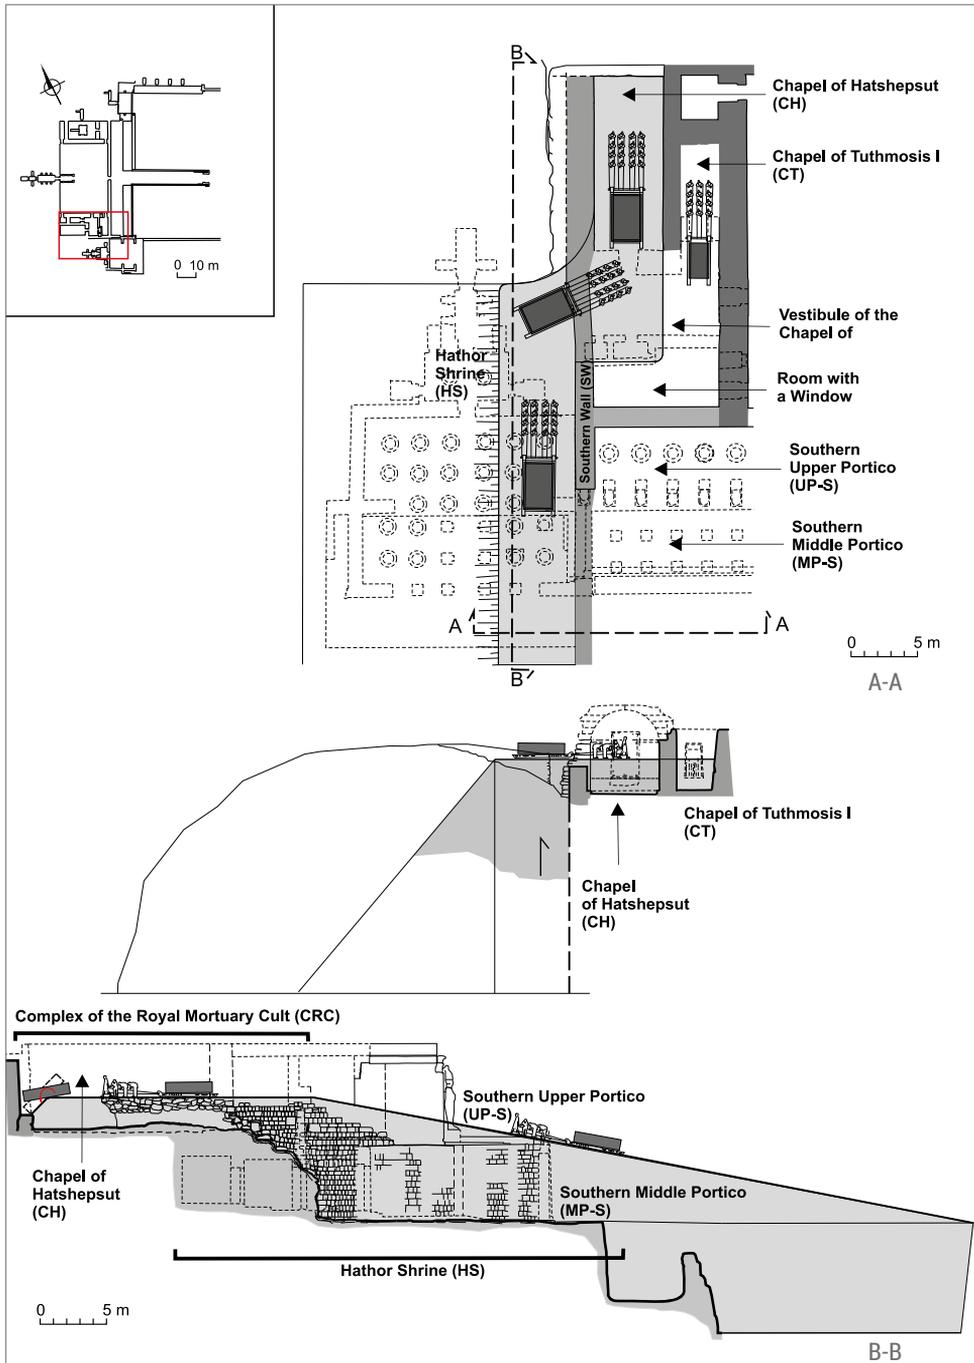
Option 2. Plan and sections A and B demonstrating the possibilities of transporting slabs from a southeastern direction (Drawing T. Dziezic)
